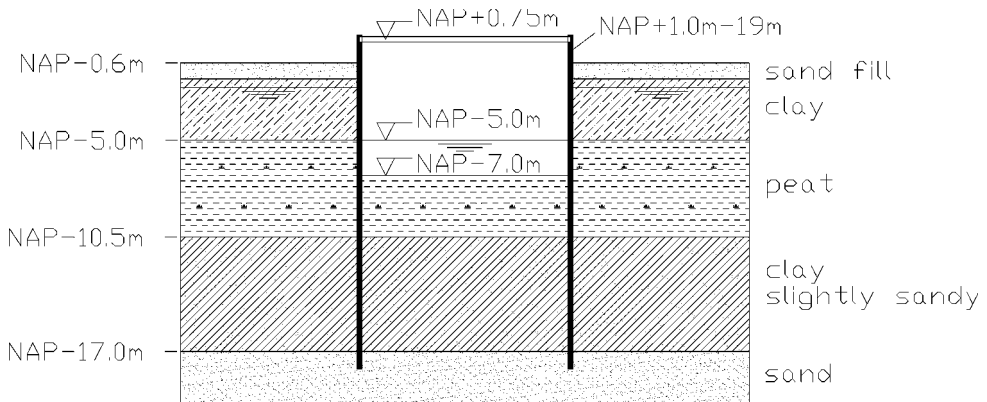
Sideview of the Rotterdam Sheet Pile Wall Field Test
